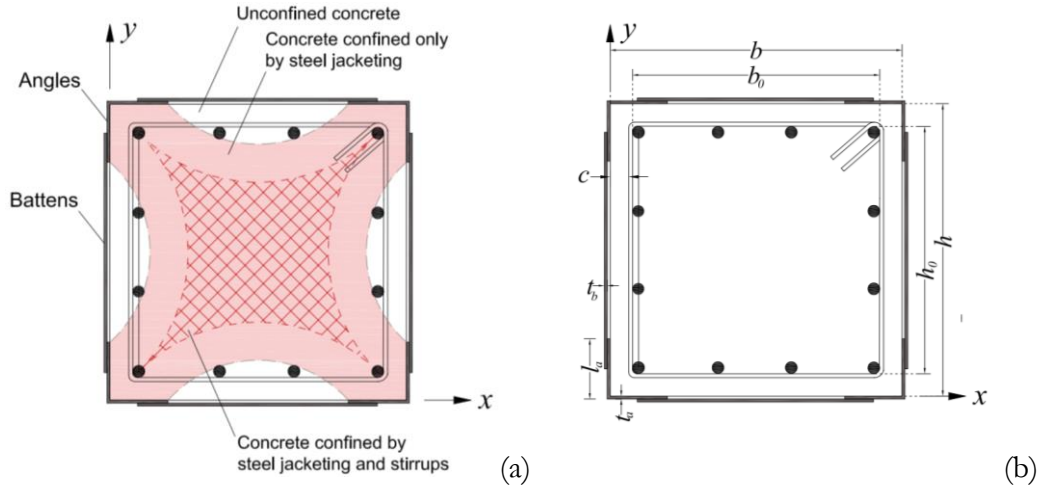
Configuration of the cross-section of a column retrofitted with steel jacketing: a) area effectively confined by stirrups and steel jacketing; b) geometric arrangement.
